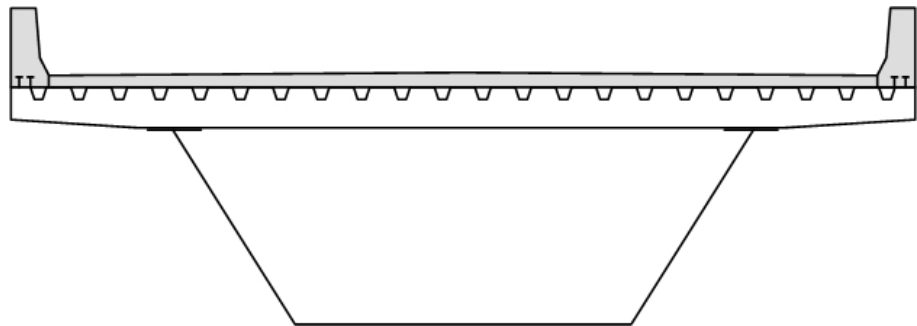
Box Girder Cross Section (at Floorbeam) with Orthotropic Steel Plate Deck
